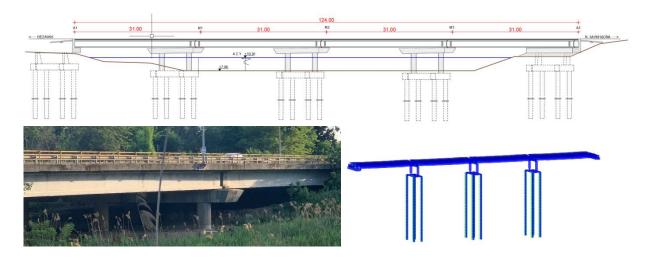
Drawings and 3D Model of the simply supported river bridge with prestressed/precast beam deck and multicolumn piers (Vardarovasi bridge).
